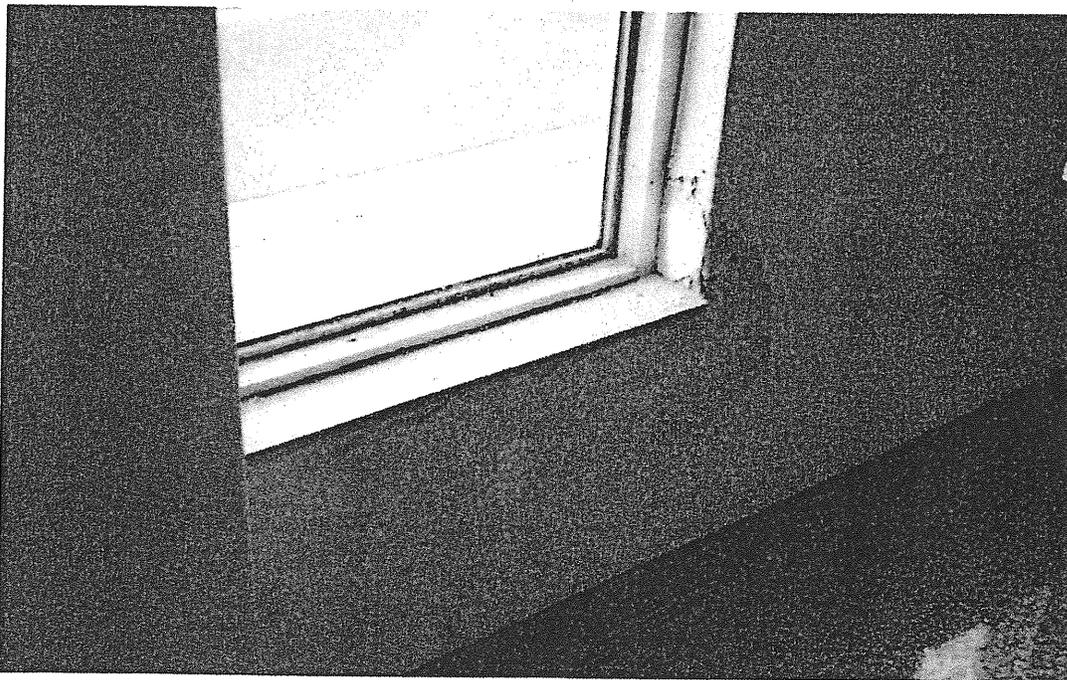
View of interior face of exterior wall at window. Note minor damage from past water infiltration.
